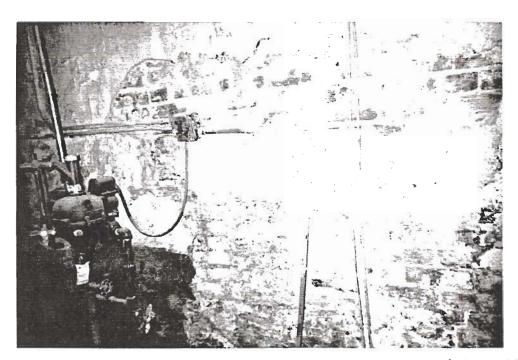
Basement Mechanical Room, Damage to Brick Wall and Plaster.
